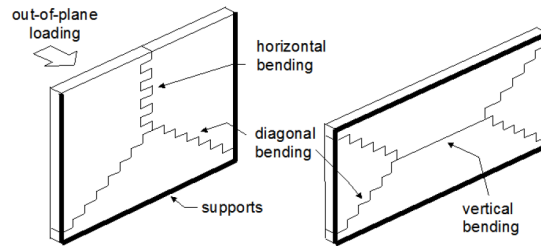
Various bending in a wall under out-of-plane loads (picture from [5])
